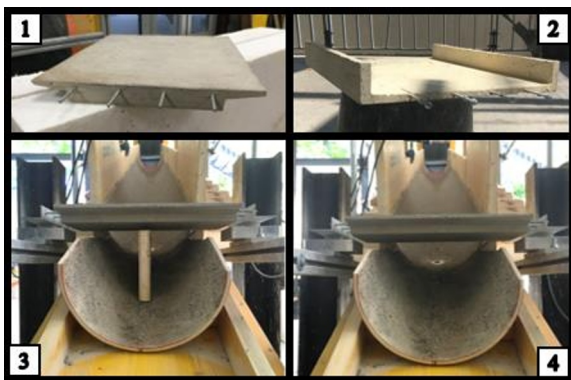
Solid slab profile (1), trough profile (2), setup with pier (3) and setup without pier (4)
